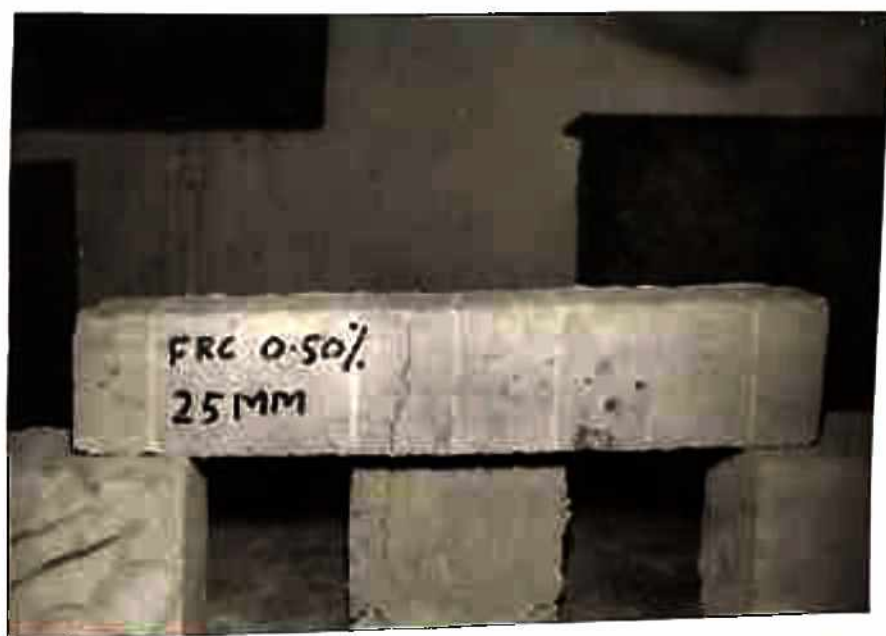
CRACK PATTERN OF SAN FIBRE REINFORCED
